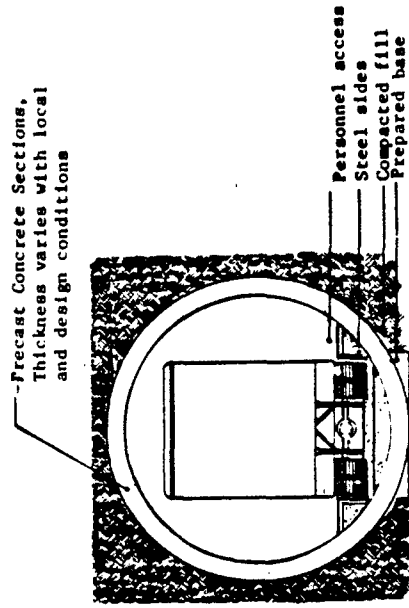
PRECAST CONCRETE CIRCULAR SECTION.
